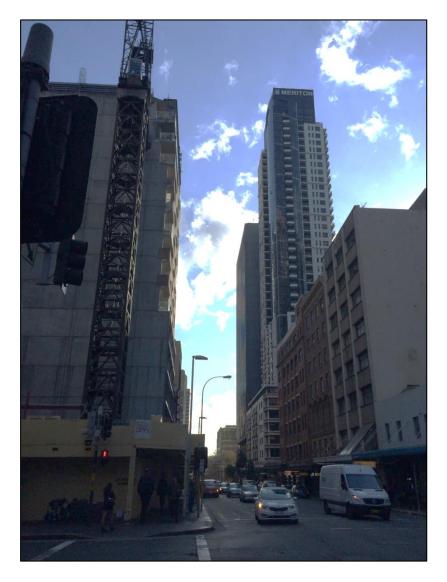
View of development surrounding the site looking west along Bathurst Street, including construction site (at 141-149 Bathurst Street) to the south of the site
